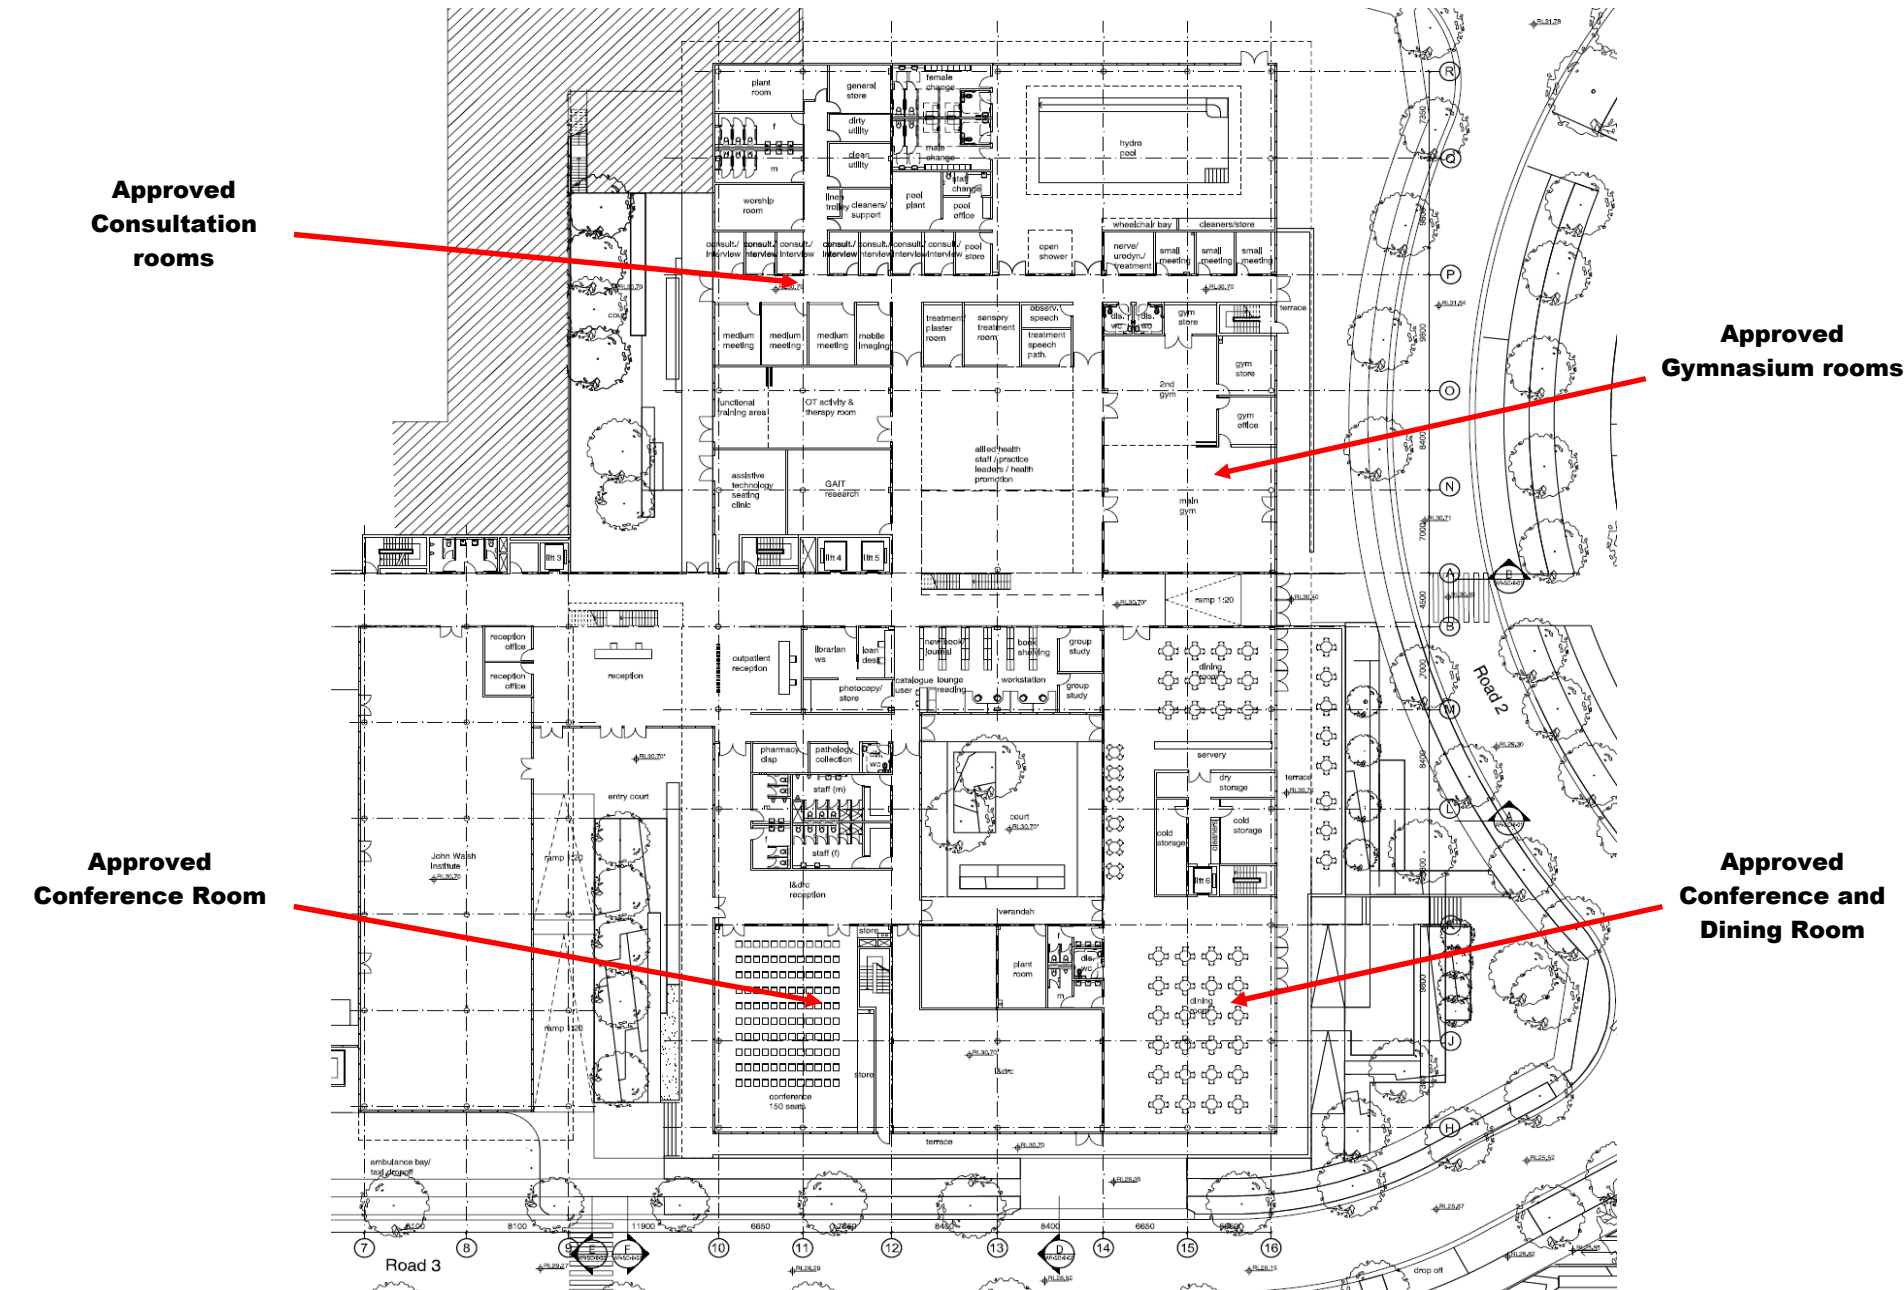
Approved Ground Floor Plan of Health Facility Main Building
